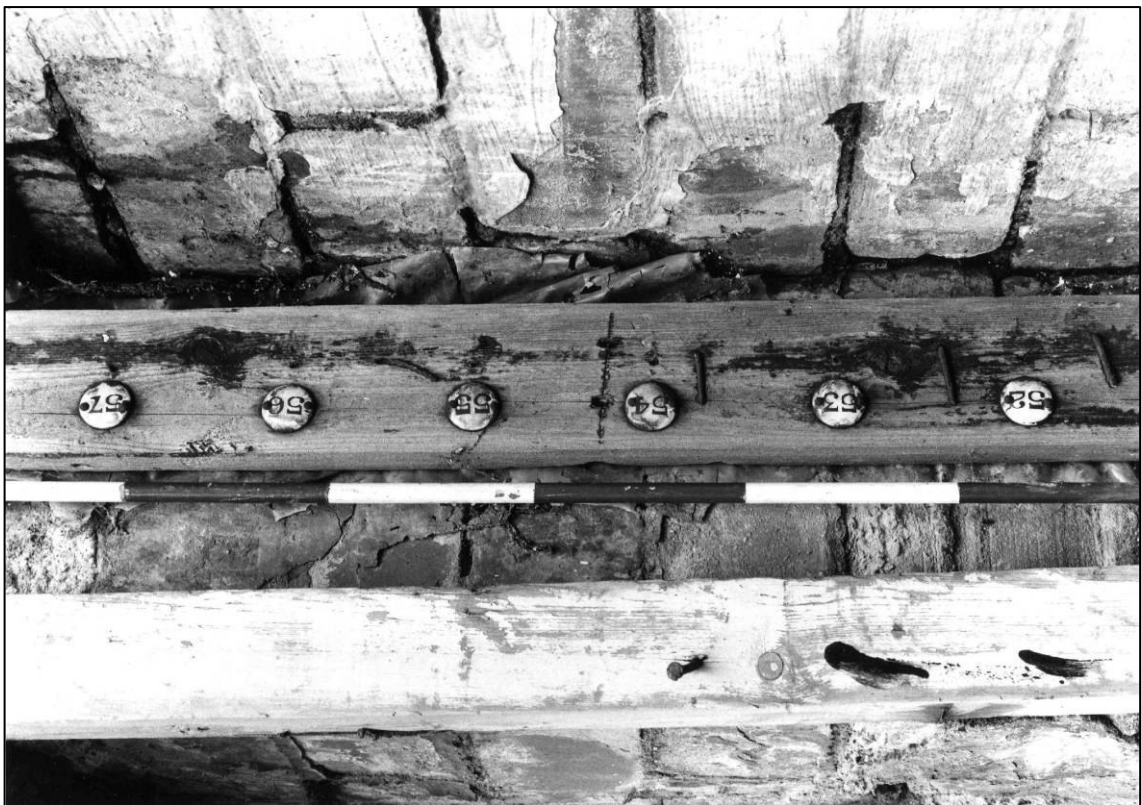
Building N1, interior west cell, former tallies to W wall, looking W (photo 2/4) (top to left).
